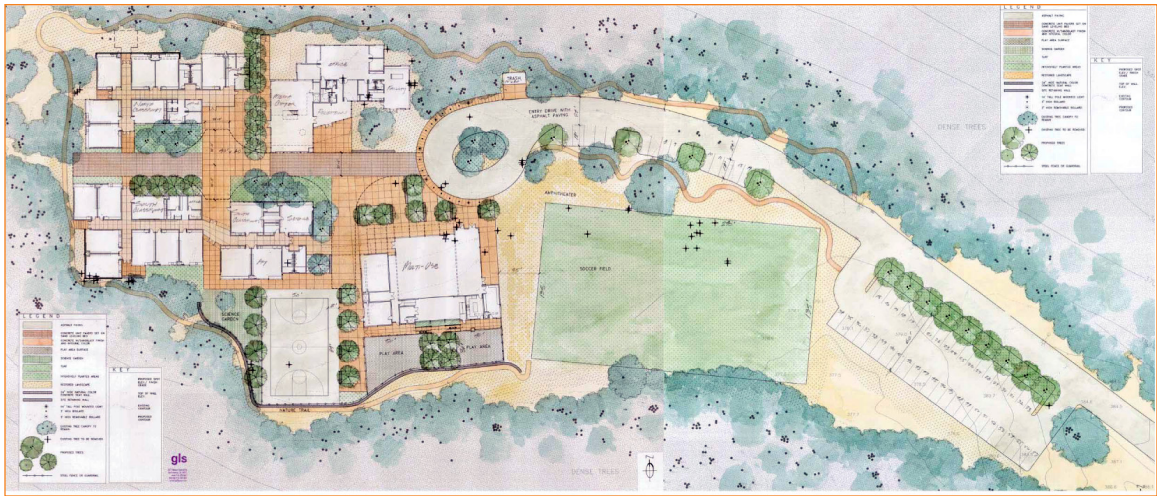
Site Plan of the Chartwell School Source: EHDD Architecture
